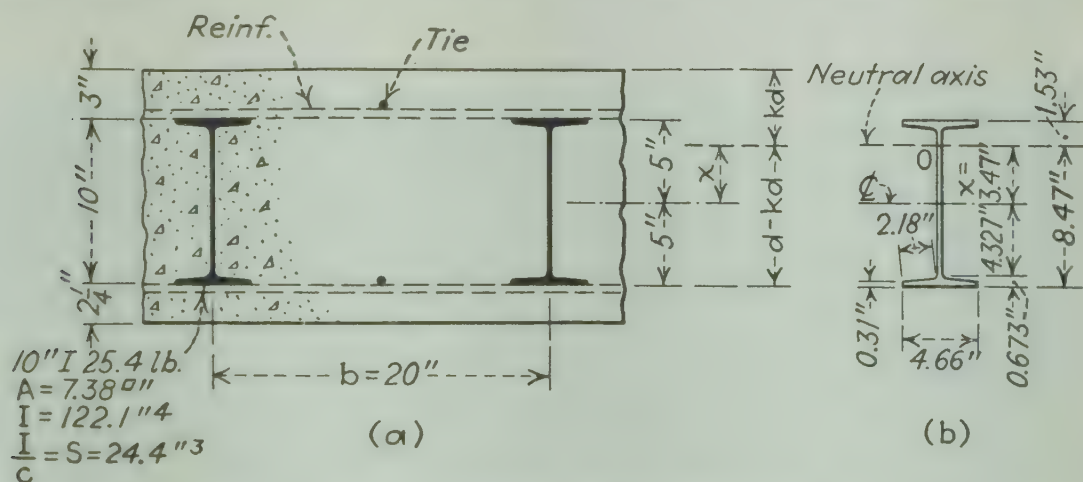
Floor of Lincoln Tunnel, New York City.
